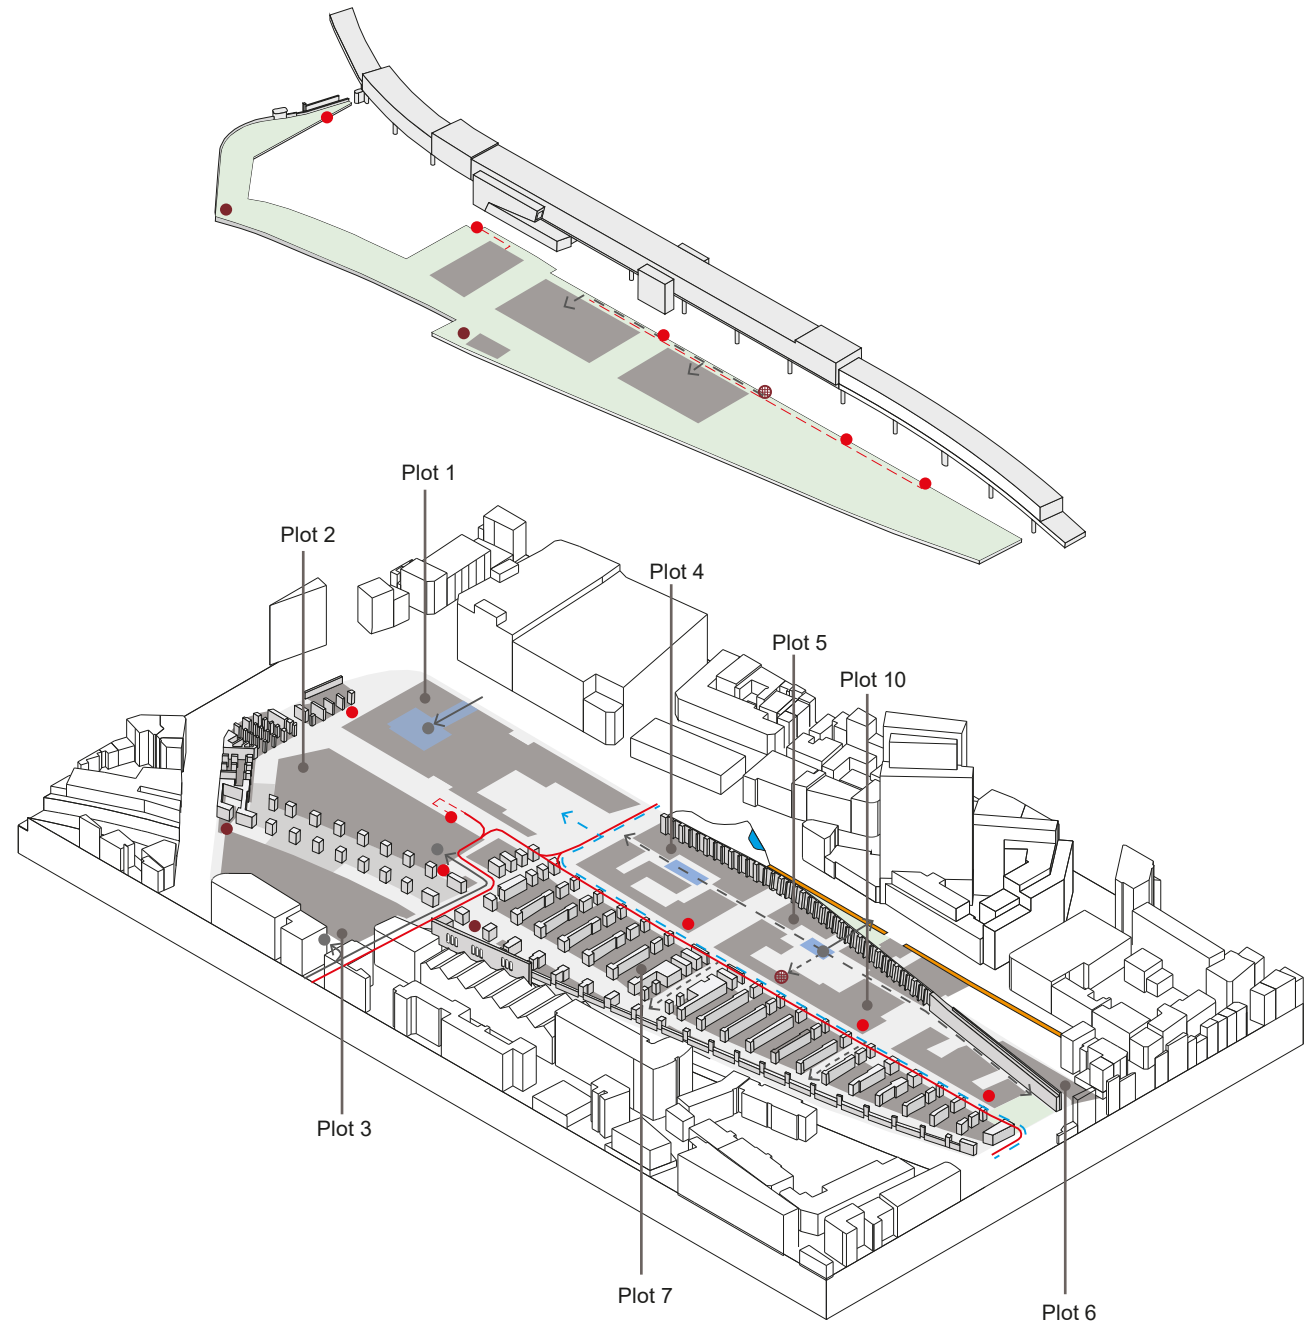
Exploded axonometric showing Emergency Overlay
